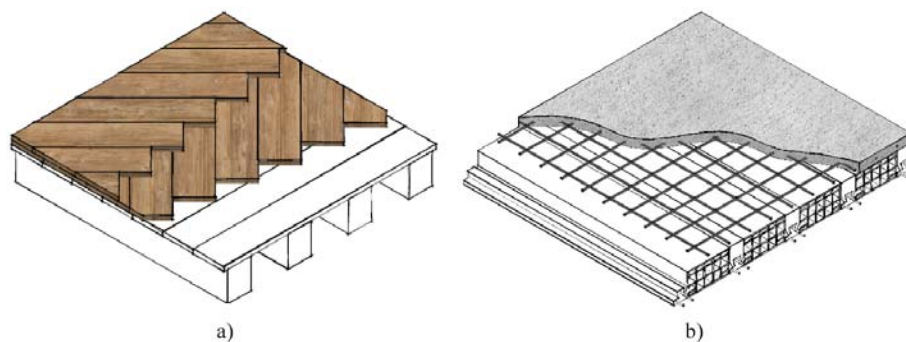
Reinforced timber floor with double planking crossed at +45° and -45° (a) and addition of composite slab in RC floors (b).
